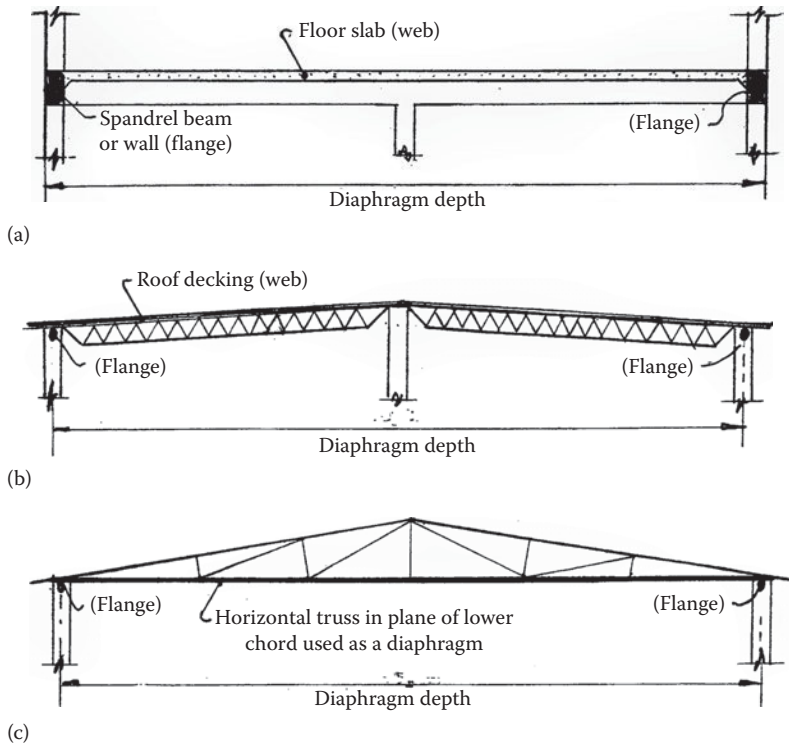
Various types of diaphragm: (a) floor slab diaphragms, (b) roof deck diaphragm, and (c) truss diaphragm. *Note:* A diaphragm may be considered analogous to a plate girder laid in a horizontal plane or inclined in the roof plane where the floor or roof deck performs the function of the plate girder web, the joints or beams function as web stiffeners, and the peripheral beams or integral reinforcement functions as flanges.
